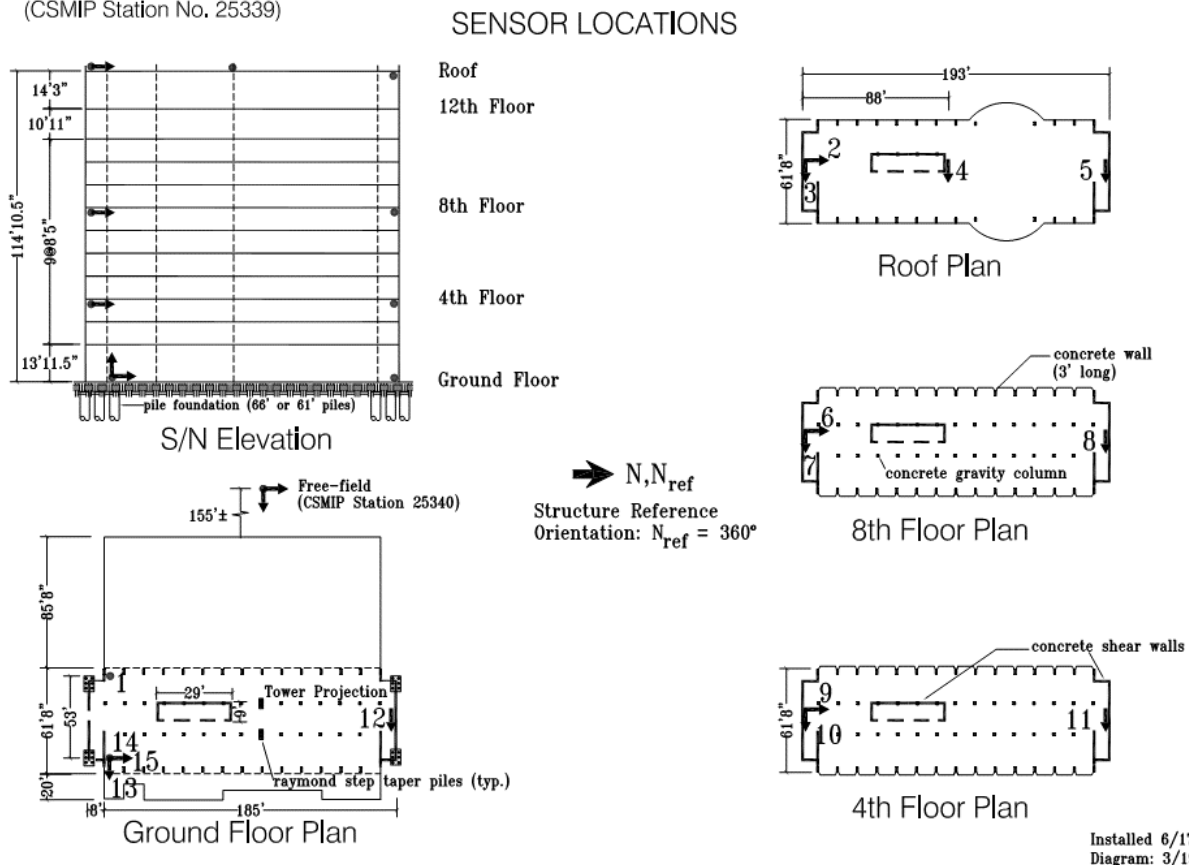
Sensor layout for instrumented building: Ventura Hotel
